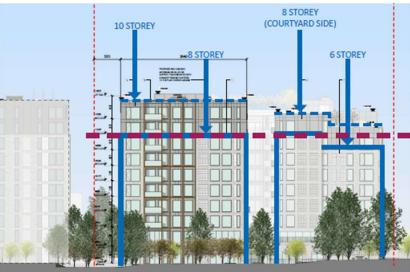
Elevations of proposed 'Tack' development to Carmanhall Road and Ravensrock Road (Source: MDO Architects)
